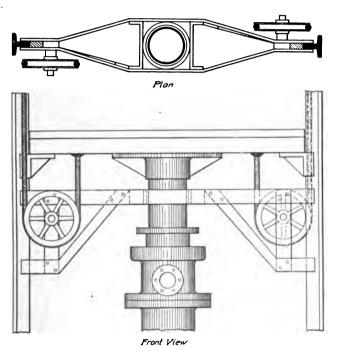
Hydraulic Elevator Plunger with Traveling Stay
